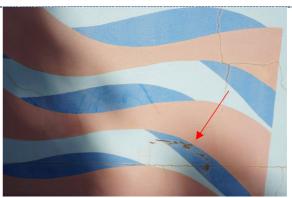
Detail – surface cracks and deformation to the mortar; chalking (UV degradation) and fading of the paint; staining to the exterior of the cracks; paint loss.
